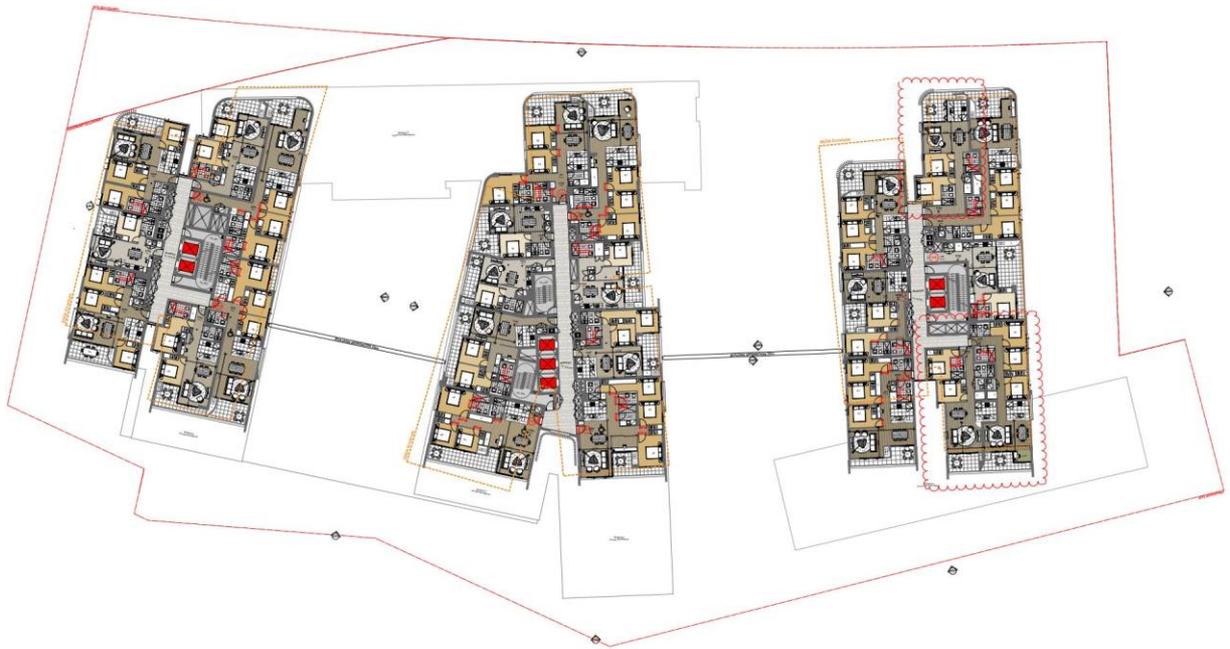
| Level 7 to 11 floor plan (Source: Applicant's RTS)
